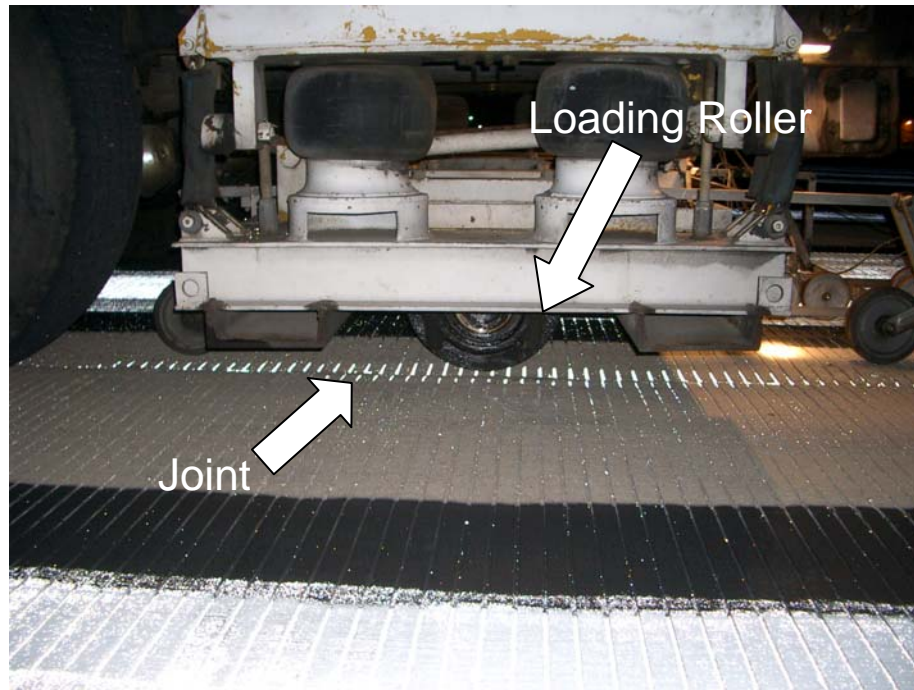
Loading Roller in Position to Test Longitudinal Joints
